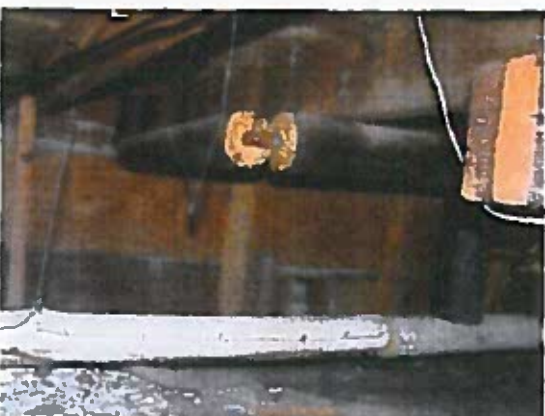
Crawlspace below Bedroom 103, looking northeast towards the exterior wall vent (with loose brick infill) and typical board form of the concrete walls.
